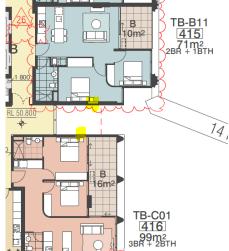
Overlooking between Apartments 415 and 416 of Building B
